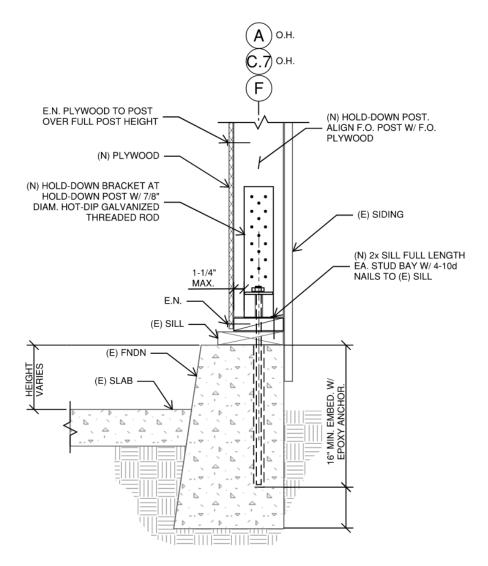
Uplift load path connection at the base of retrofit shear wall.
